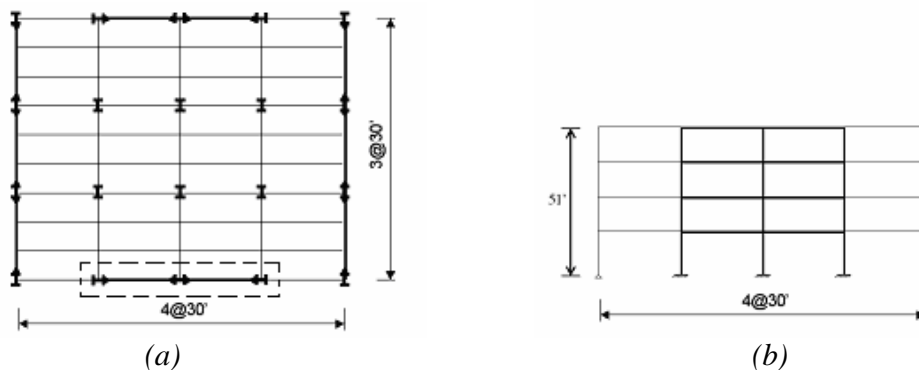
NEESR 4- story prototype structure (a) plan view and (b) elevation
